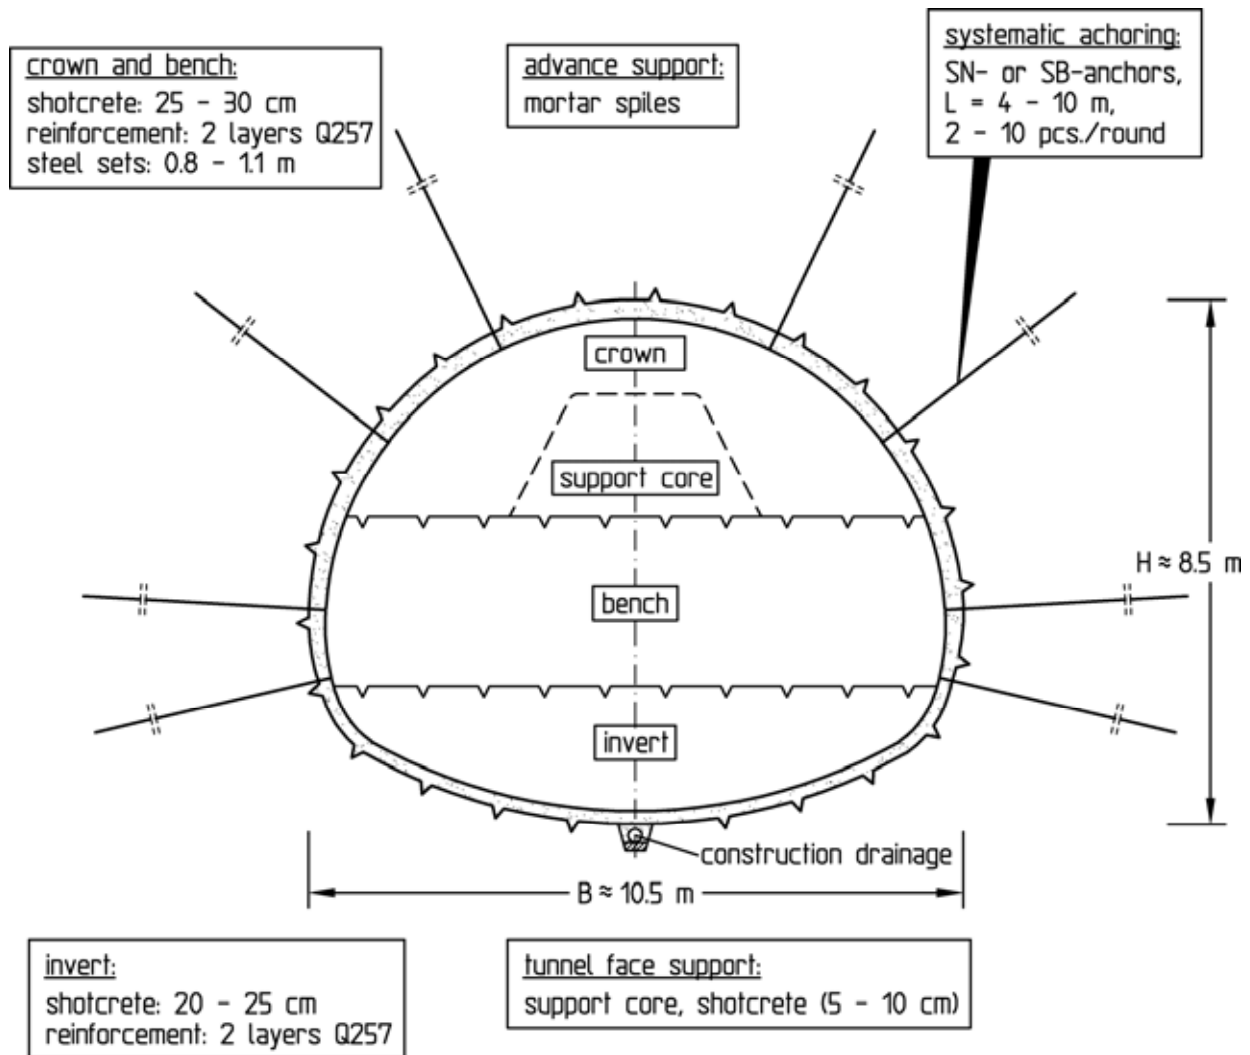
Excavation and support, standard profile, excavation class 7A, cross-section
